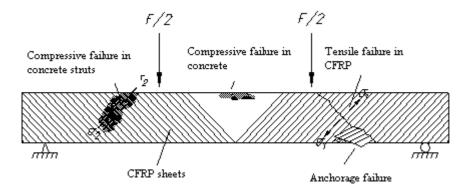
Failure modes for strengthening in shear with CFRP sheets (Täljsten et al., 2011).
